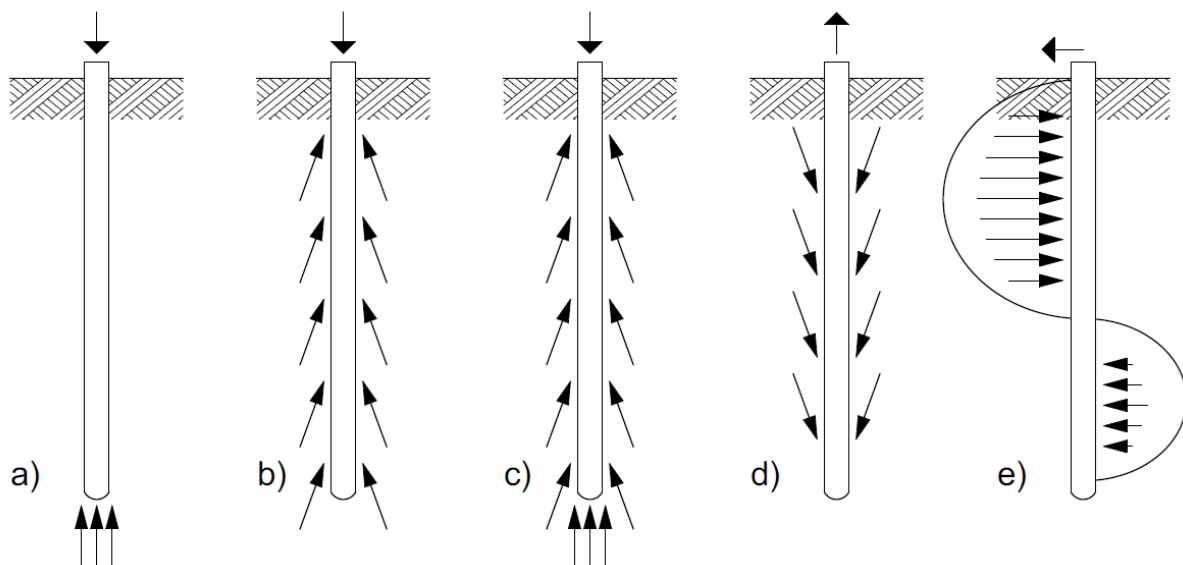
a) end bearing pile, b) friction pile, d) combined pile, d) tension pile, e) anchor pile
